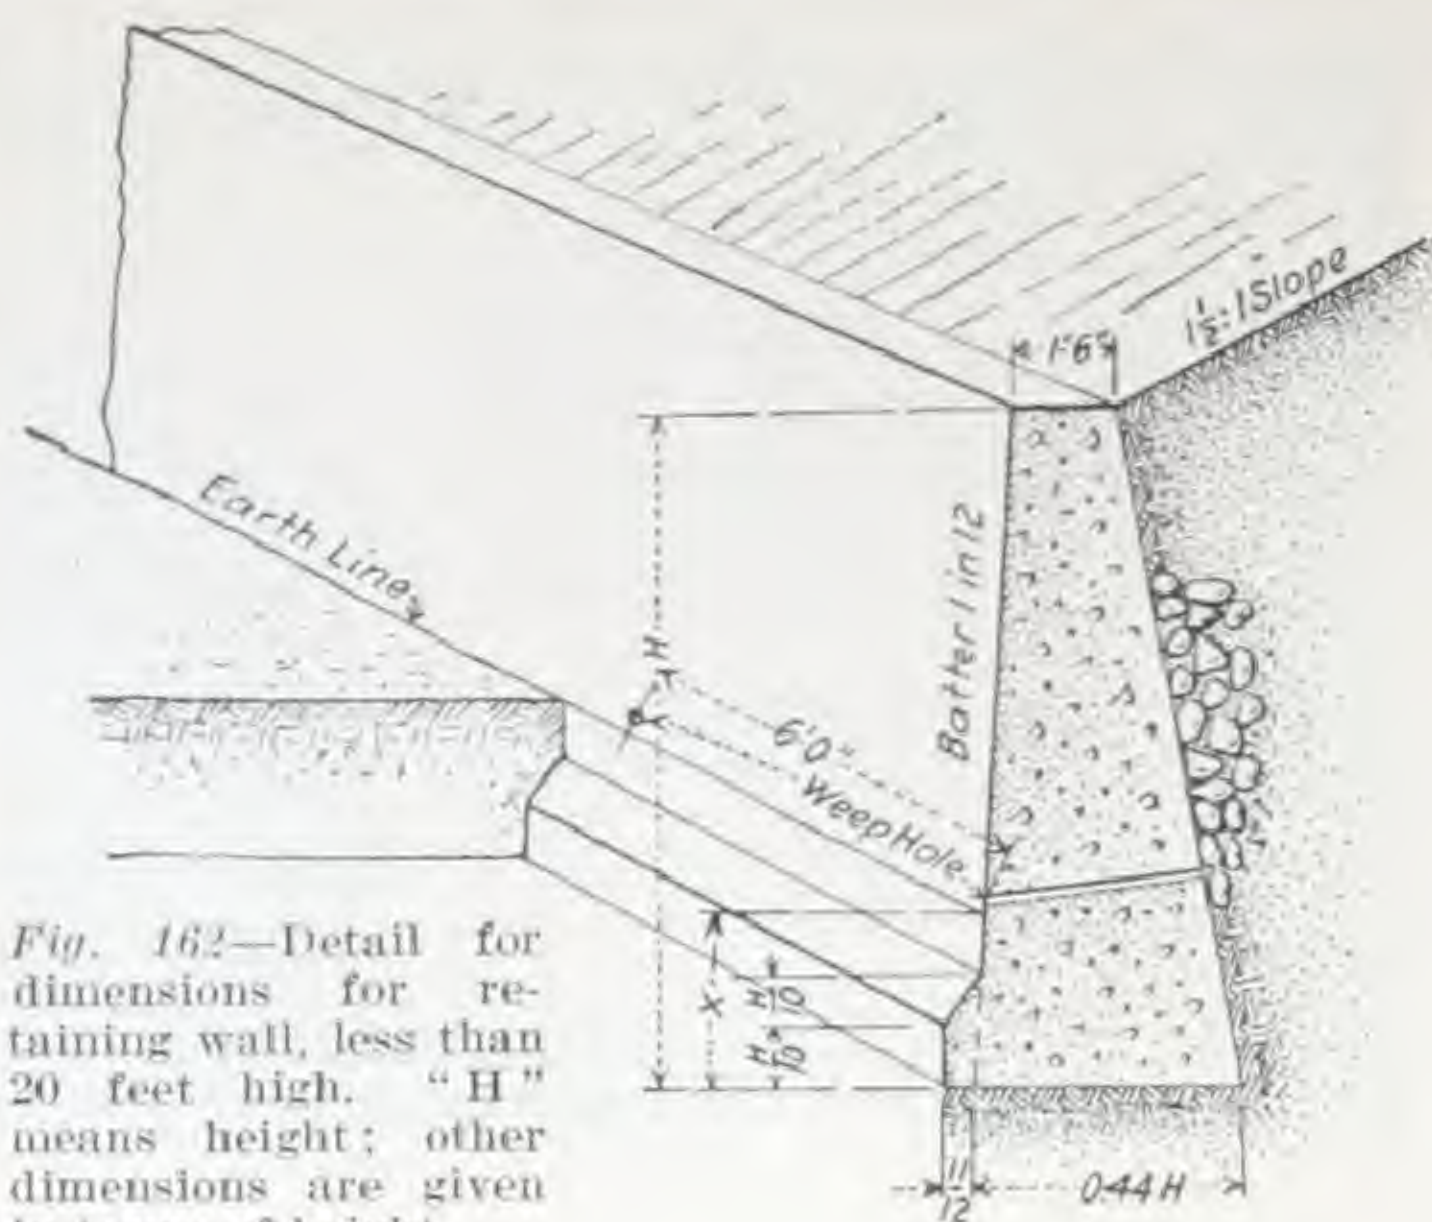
Detail for retaining wall, less than 20 feet high. "H" means height; other dimensions are given in terms of height.
